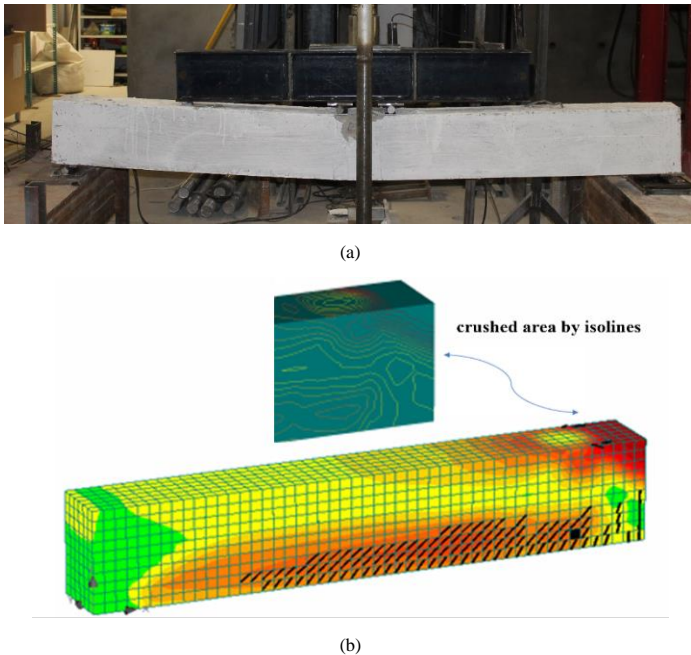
(a) Concrete crushing in the over-reinforced beam (b) numerical prediction at failure
